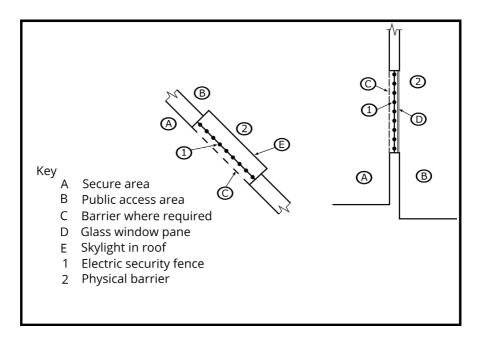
Typical fence constructions where the electric security fence is installed in windows and skylights
